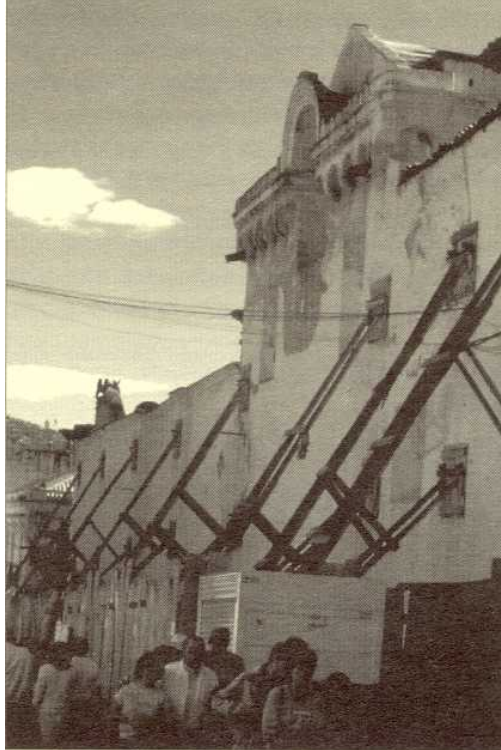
Adobe buildings damaged in the March 1987 earthquake.
